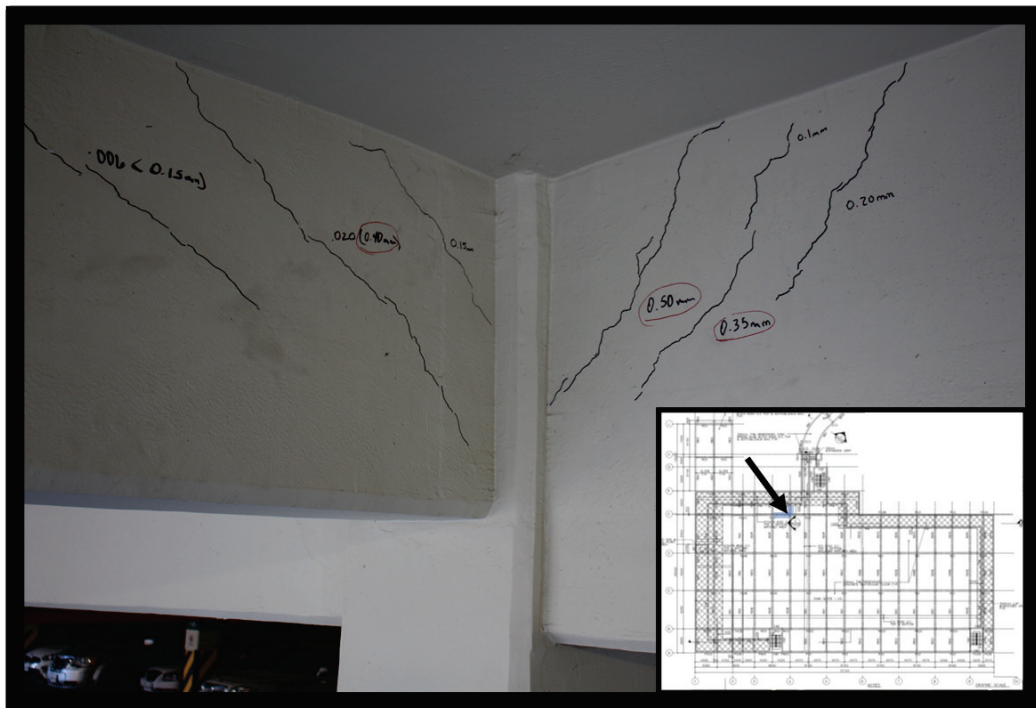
Typical diagonal crack in beam showing decrease in crack width at bottom and top of beam.
